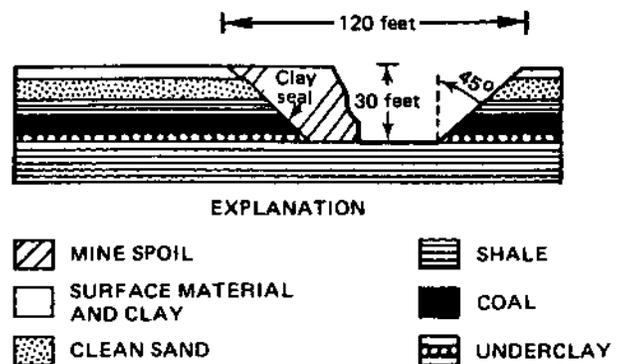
Cross section through first cut showing clay seal supported by layer of mine spoil
